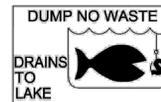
PLATE SHALL BE ADDED TO STORMWATER INLETS AS REQUIRED BY THE CITY.
